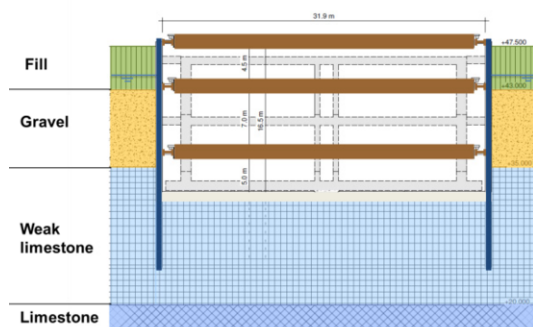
Cross section building pit, including temporary struts and the final construction (dotted lines).
